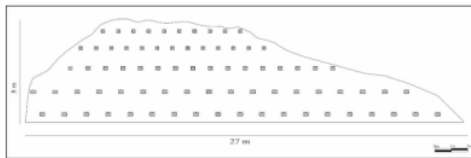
Sketch illustration Rock bolt 1 Inch Diameter 3.5 ft Spacing On Section 2 Slope
